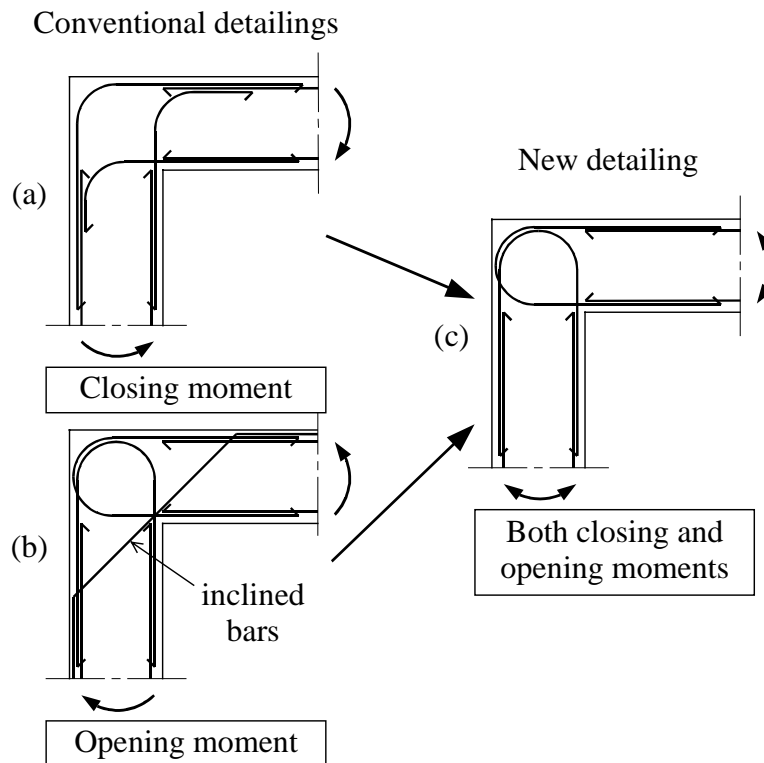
Reinforcement detailings previously used in the Swedish Shelter Regulations in (a) closing and (b) opening frame corners. The new reinforcement detailing evaluated herein is shown in (c).
